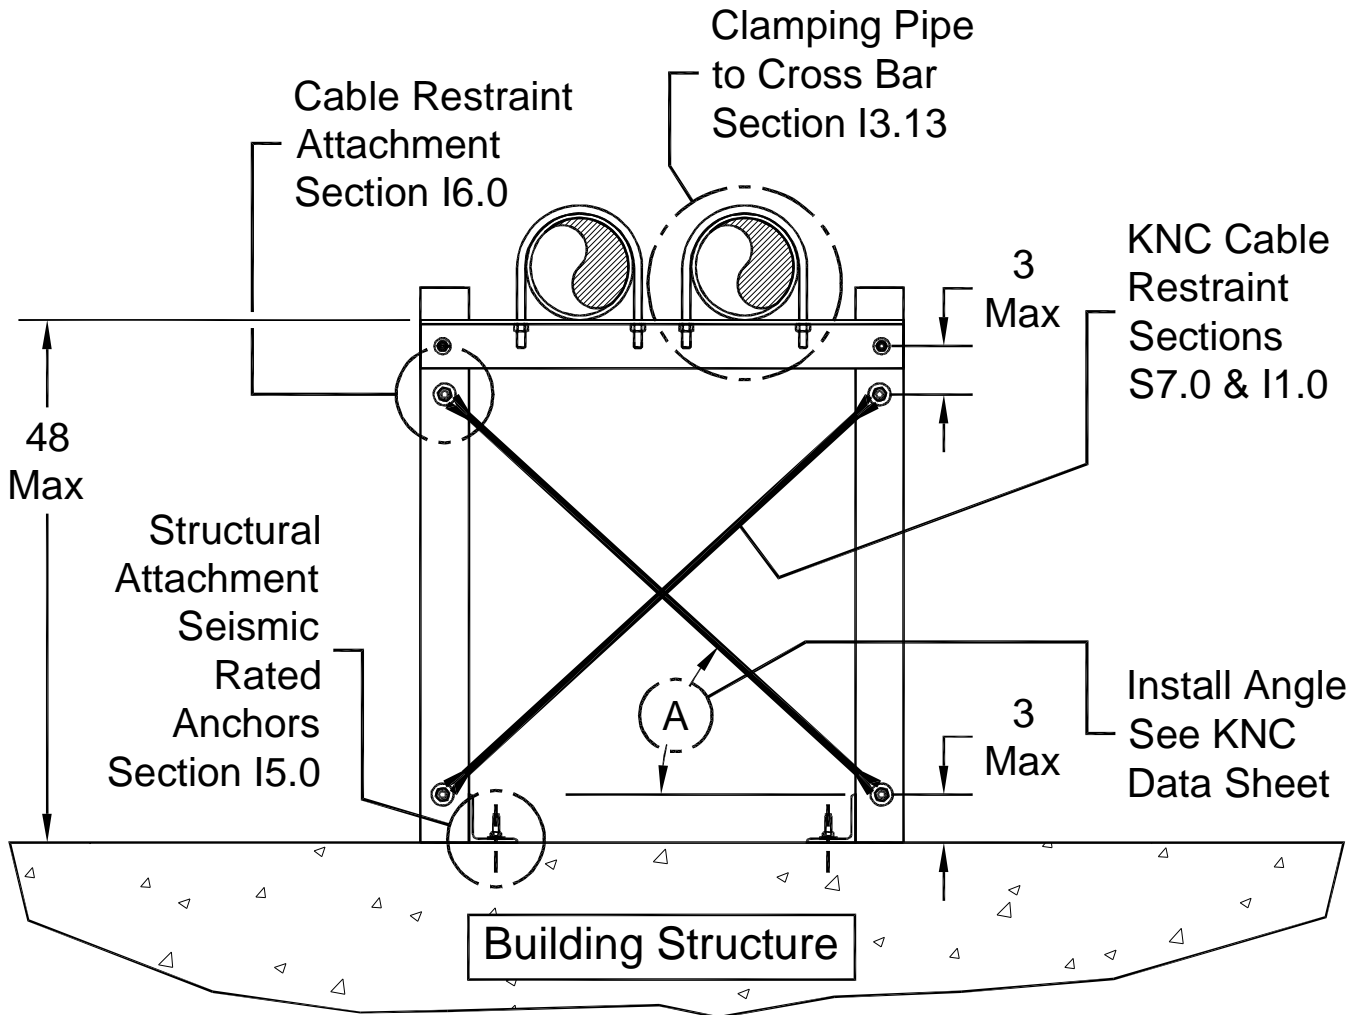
; Transverse (T) Cable Restraint Schematic Arrangement for Floor or Roof Mounted Pipe – Two Restraints Attached to the Vertical Legs Acting as Cross Braces – The Anchors Attaching the Stand to the Floor Must be Seismically Rated Cracked Concrete Anchors with a Current ICC-ESR Number
